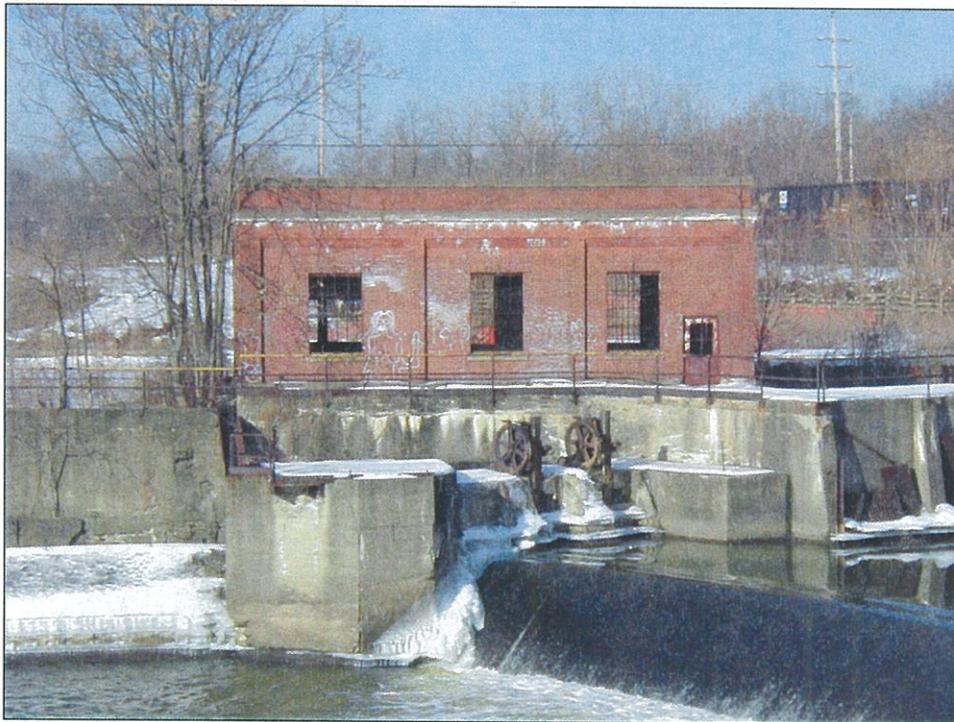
Warren Water Works Dam. Detail of screen house and spillway upper gate.
